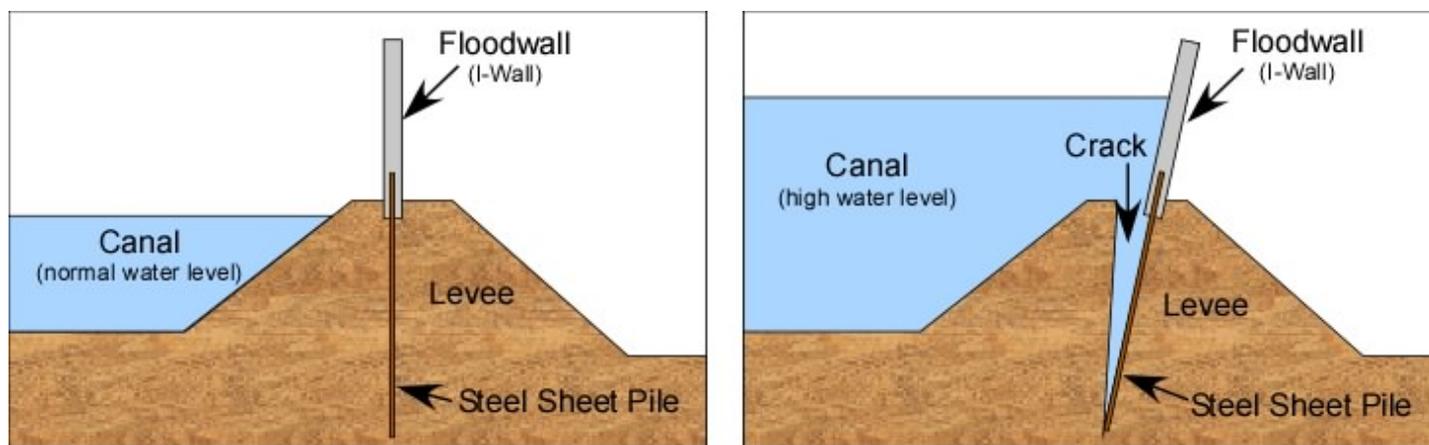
Illustration of crack development as water in a canal rises on the floodwall and pushes outward on the floodwall as observed in 1985 experiments by U.S. Army Corps of Engineers.
